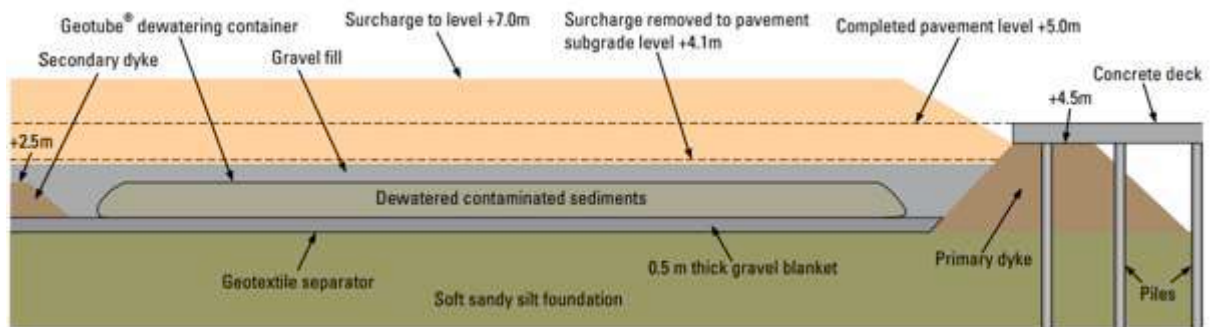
Section through the Embraport earthfill platform showing location of the insitu Geotube® dewatering of contaminated sediments
